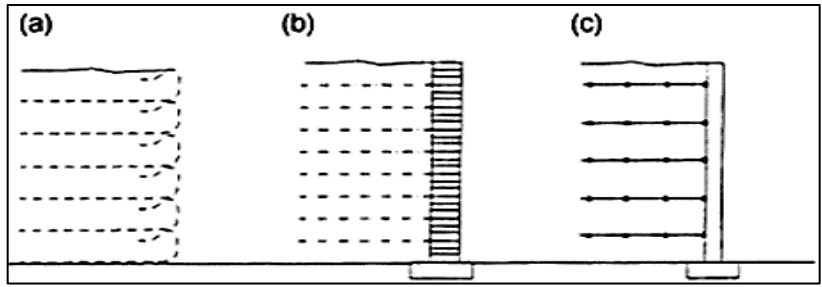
Typical in-situ soil-reinforcing techniques
